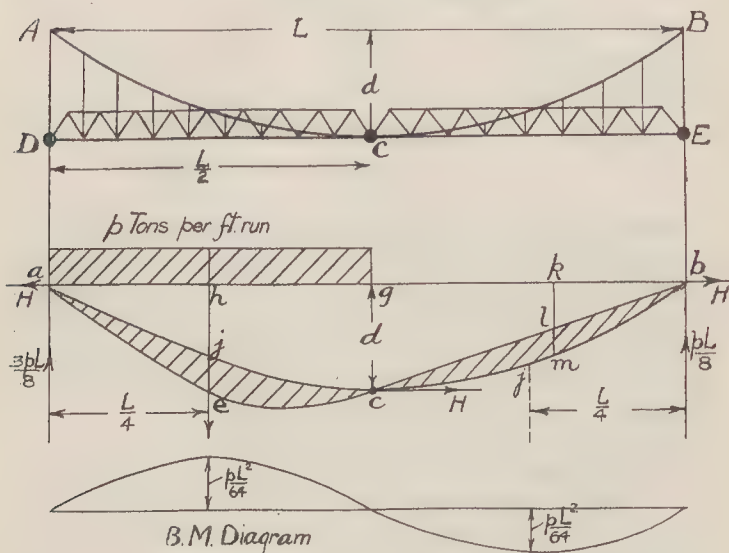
Suspension Bridge with Hinged Stiffening Girders.
